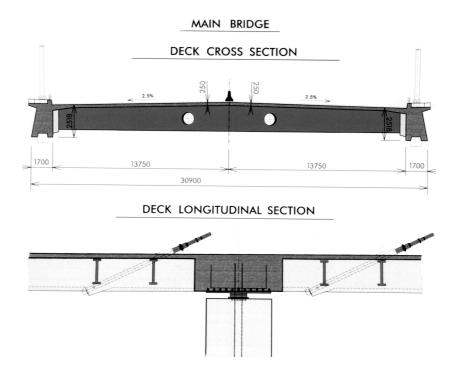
Tagus Bridge — main bridge deck cross section. (Courtesy of Campenon Bernard.)
